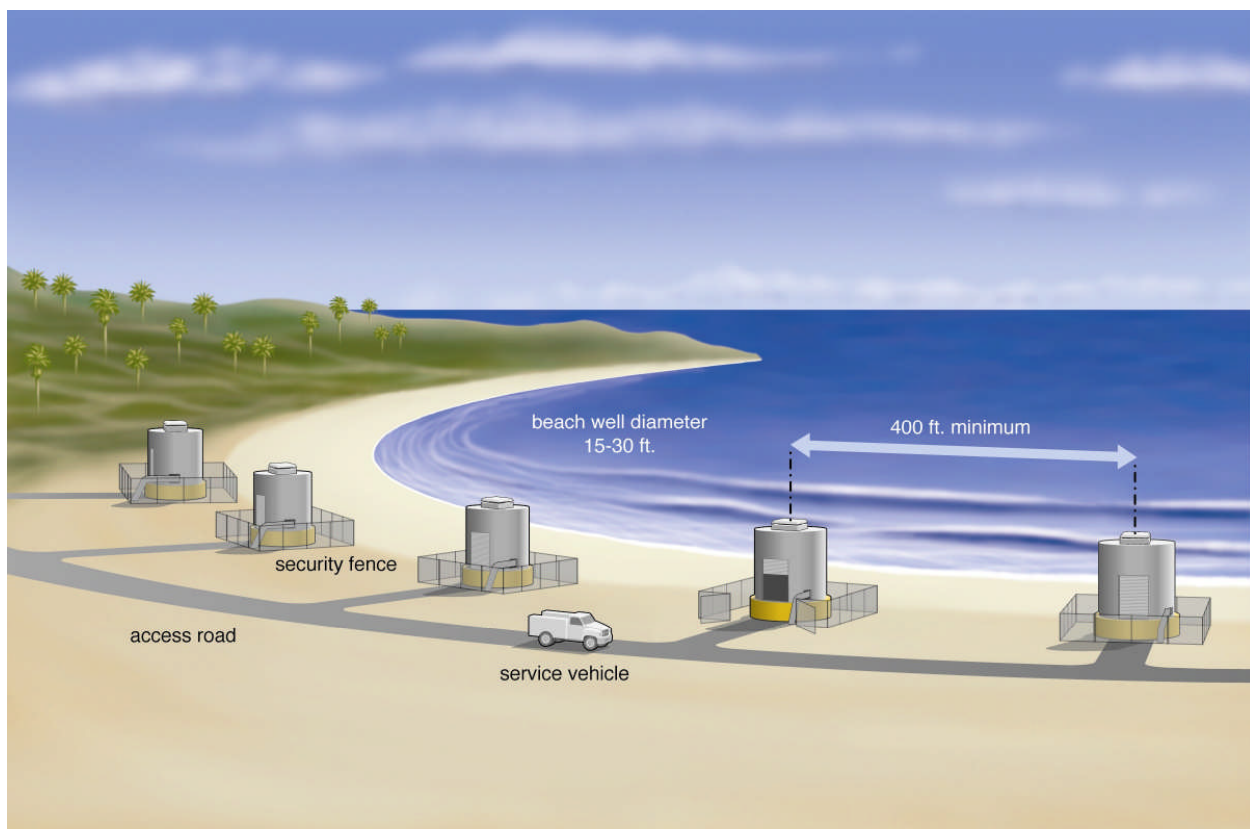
A Horizontal Beach Well System for 10 MGD Desalination Plant
